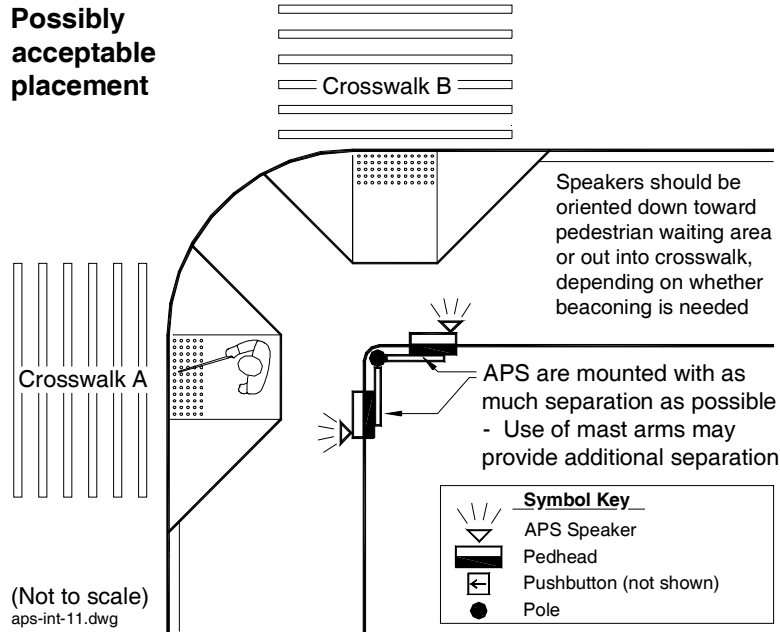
Possibly acceptable placement for pedhead-mounted APS on the outside of the pedheads. Provide as much separation as possible.
